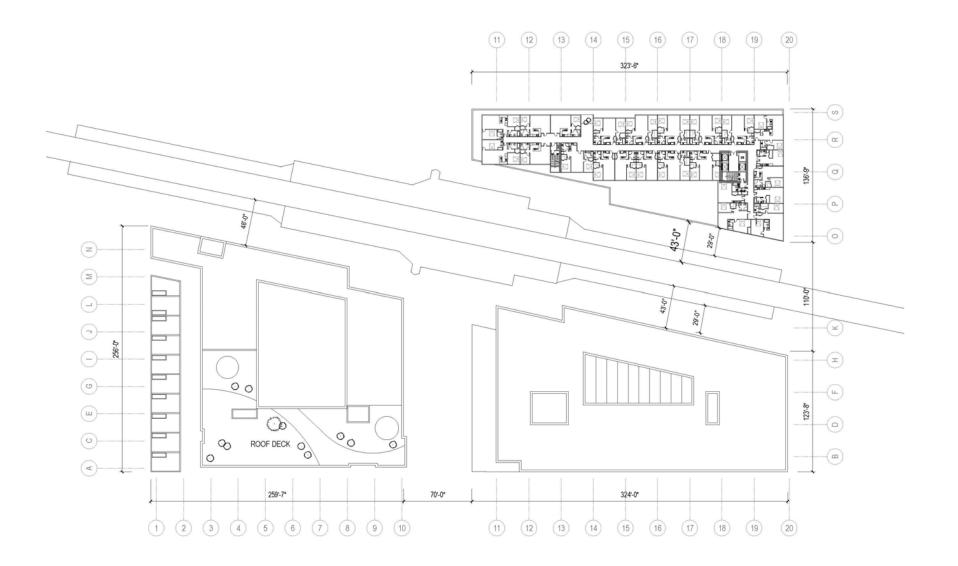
Floor Plan, 8<sup>th</sup>-18<sup>th</sup> Floors
